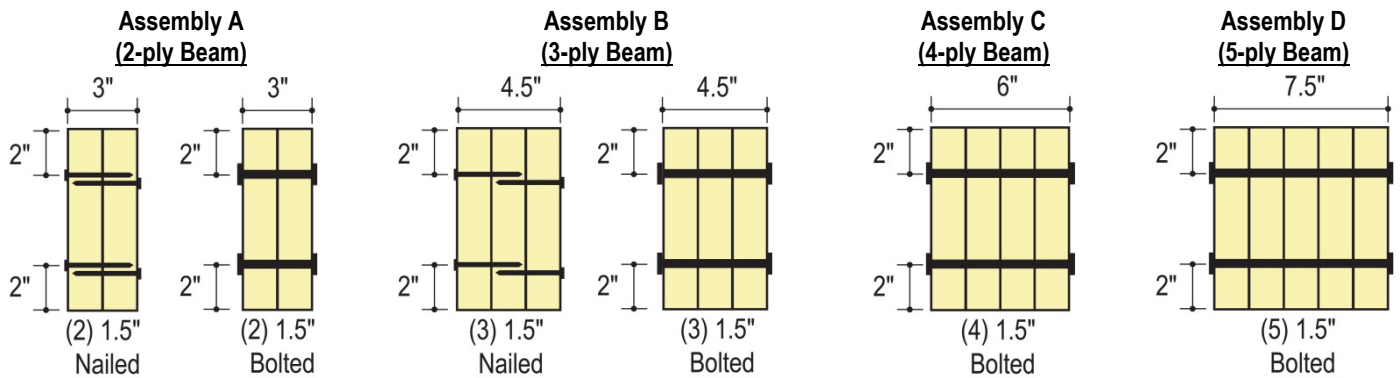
CONNECTION REQUIREMENTS FOR MULTIPLE MEMBER SIDE-LOADED BEAMS
